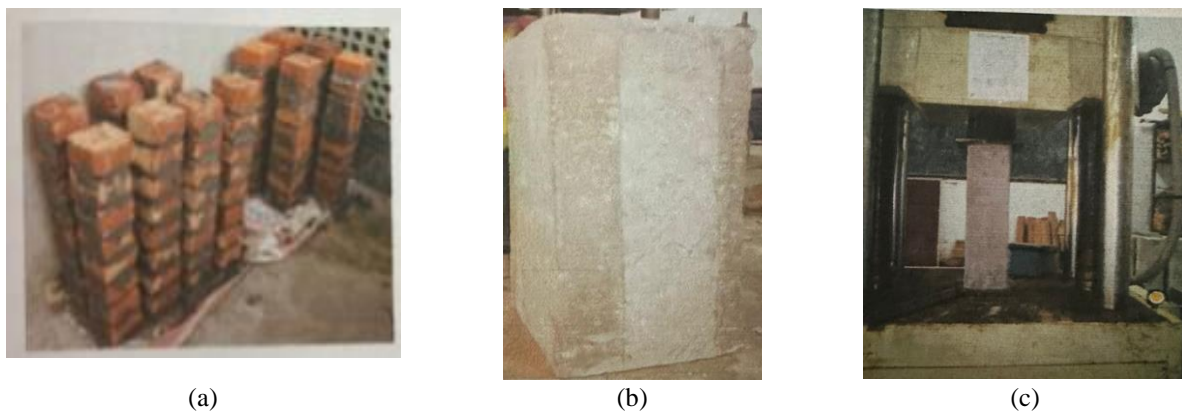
(a) Brick masonry column, (b) strengthened brick masonry column and (c) experimental setup.
